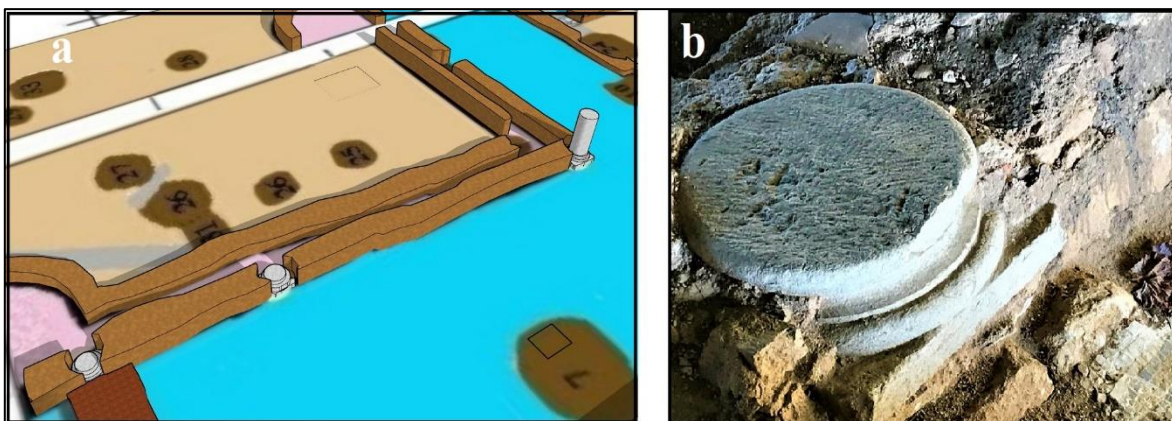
6-Peristyle wall (south-west facing) with embedded column and pinkish wall surface. a) 3D demonstration of the wall and column location (image is not according to scale, made just to indicate the column position), b) showing the position of the column as embedded in the wall from the site.
